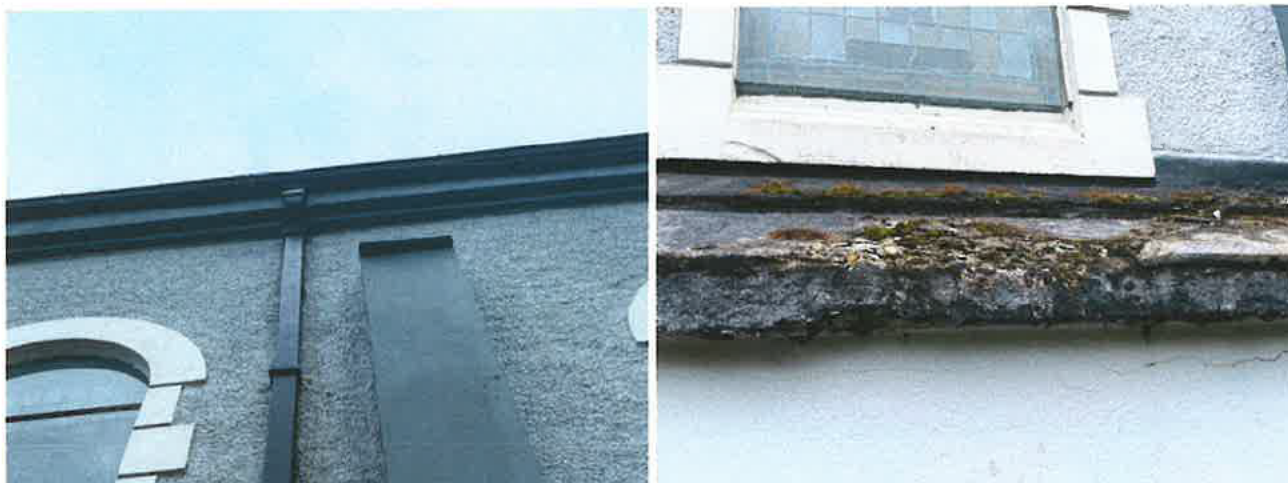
; There is evidence of water ingress internally, relating to this rainwater downpipe on the north wall of the nave. Photo 18; Damage to edge of roof slab over confessional box to north transept, due to the roof not being adequately weathered.
